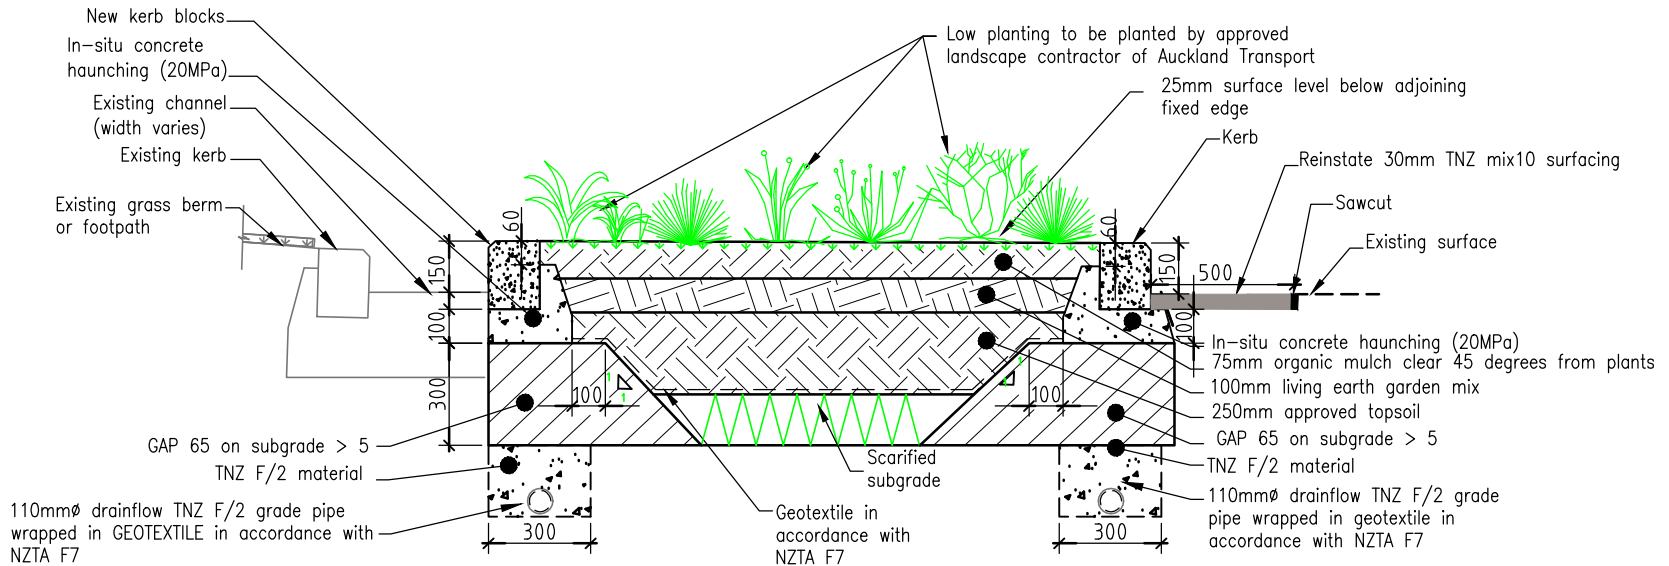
DETAIL CROSS SECTION A-A FOR ISLAND PLANTERS
